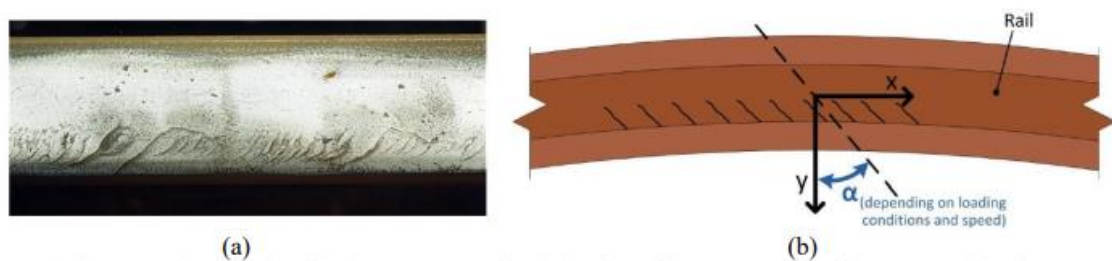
(a) severe head checks (b) illustrate head checks on the outer rail's gauge corner [23].
